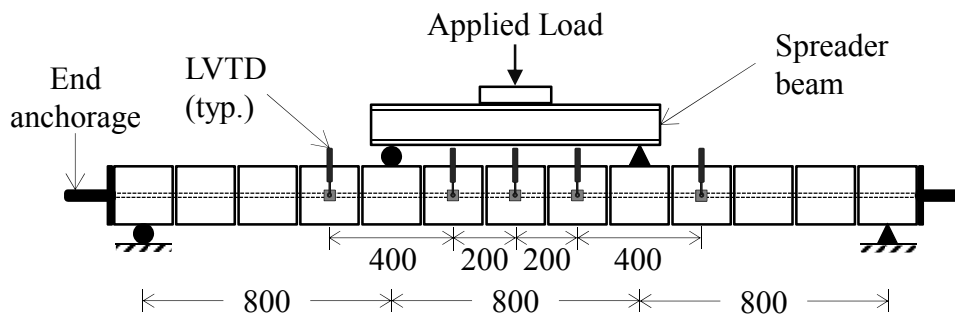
Wall Splice Specimen Test Setup and Instrumentation Details (Modified From Ahmed and Feldman [2])
